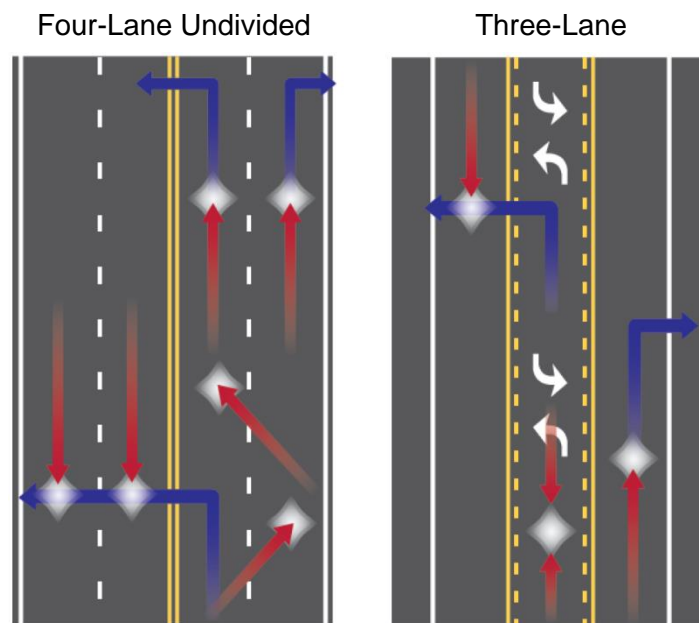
Crossing and Through Traffic Conflict Points at Intersections for a Four-Lane Undivided Roadway and Three-Lane Cross Section
